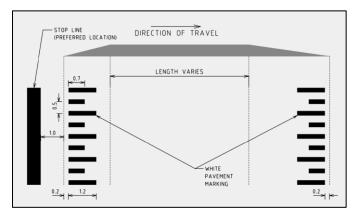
Typical RSP Linemarking at Intersections (Stop Line positioned prior to RSP)
